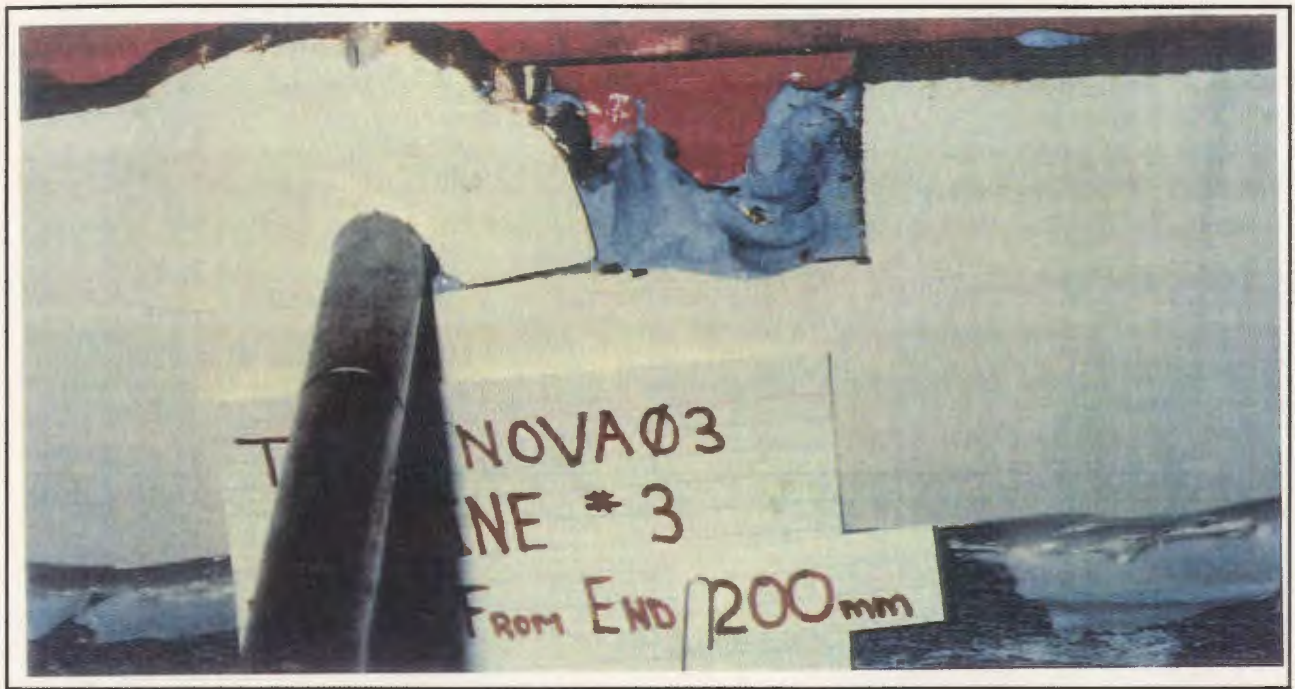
Photo of excavated cross-section along mid length of model pipeline #3, 40mm wide trench, Test 03.
